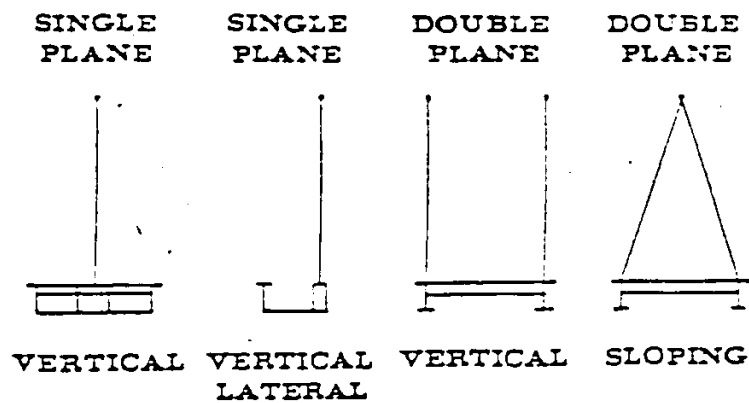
Transverse Cable Arrangement (After [15])
